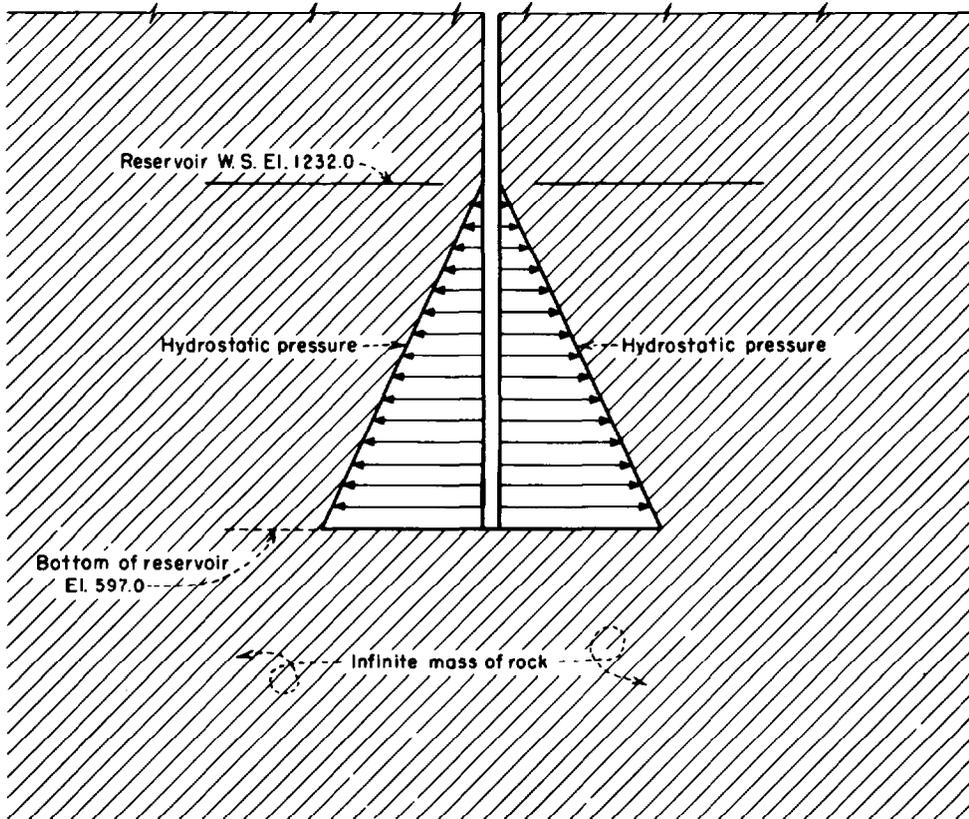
Hoover Dam studies—infinite abutment closed at base of dam.—DS2-1(287)
